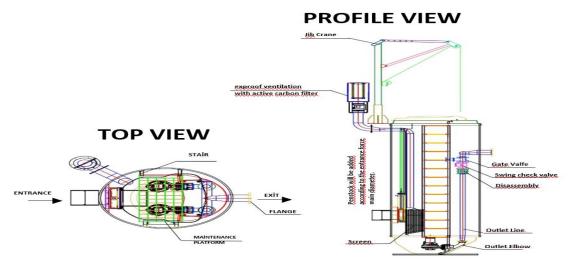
Manhole Type Ready Wastewater Pumping Station Type Sectional View
